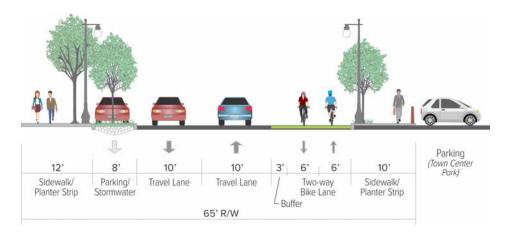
TOWN CENTER PLAN CROSS-SECTIONS (CONT.)
